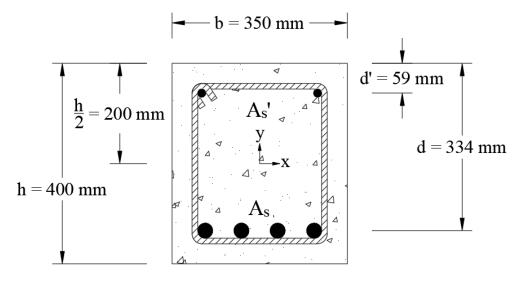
Doubly Reinforced Concrete Beam Cross-Section
